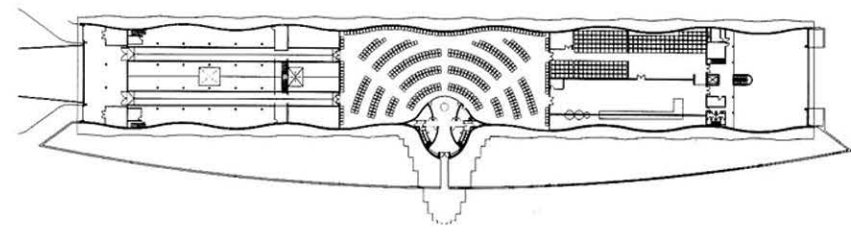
WINERY'S LAYOUT, REFLECTING THE SHAPE OF THE WALLS
